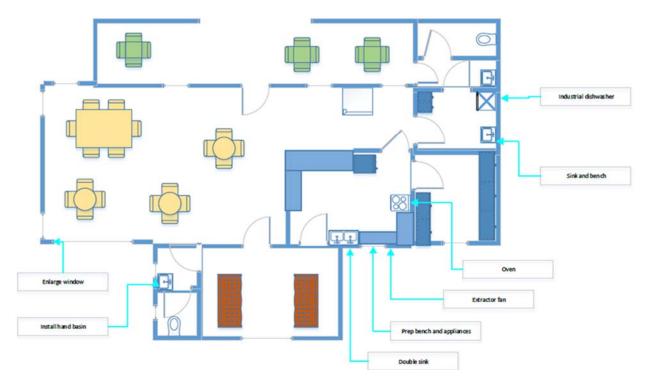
Draft Plans, Cooinda Café, 137 High Street, Terang
